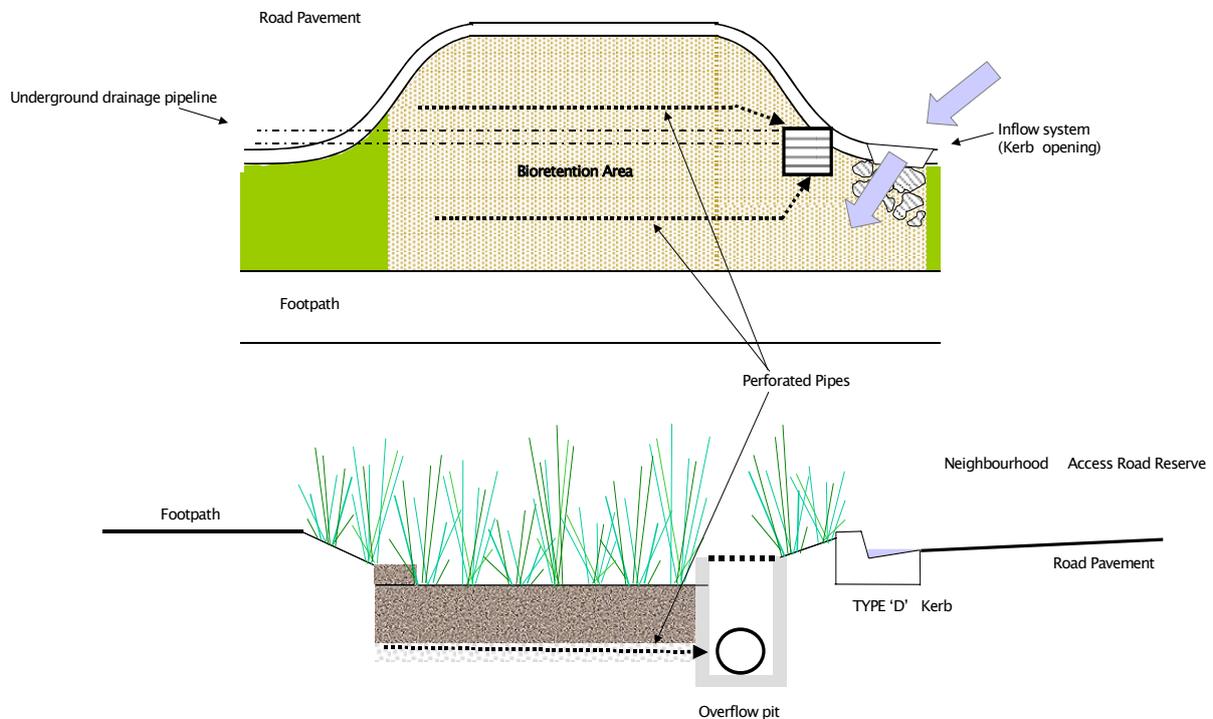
G: General Layout and Cross Section of Proposed Bioretention System
